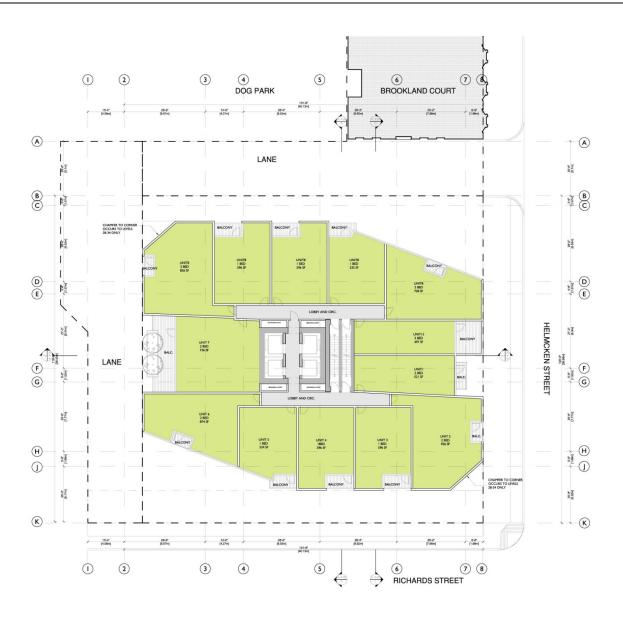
Typical Strata Floor Plan - Upper Levels 8-34
